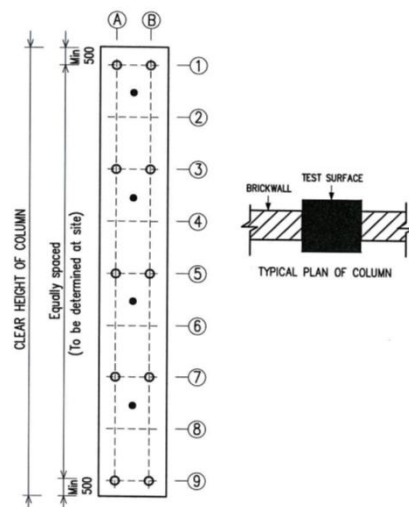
TYPICAL MATERIAL TEST AT COLUMN
